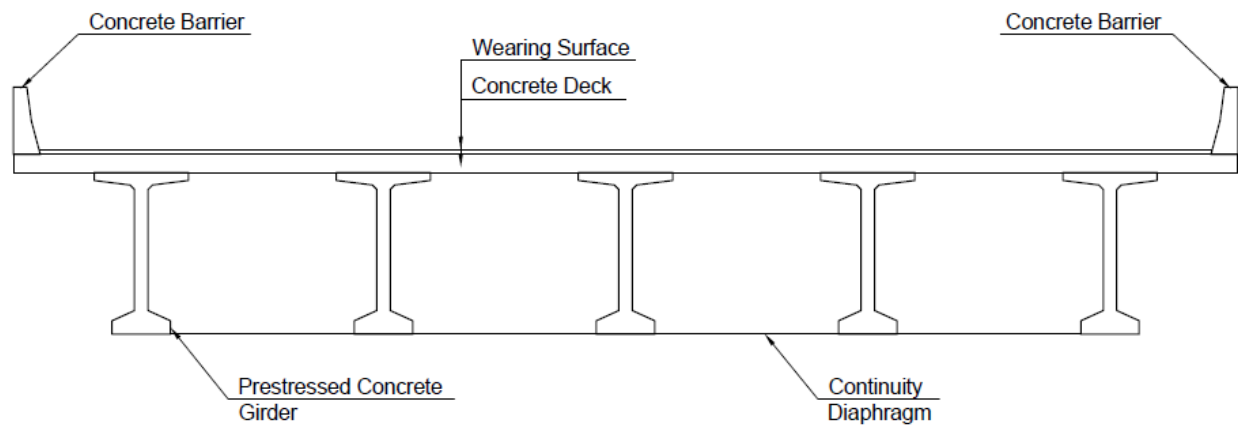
Cross-Section of a Prestressed Concrete Girder Bridge
